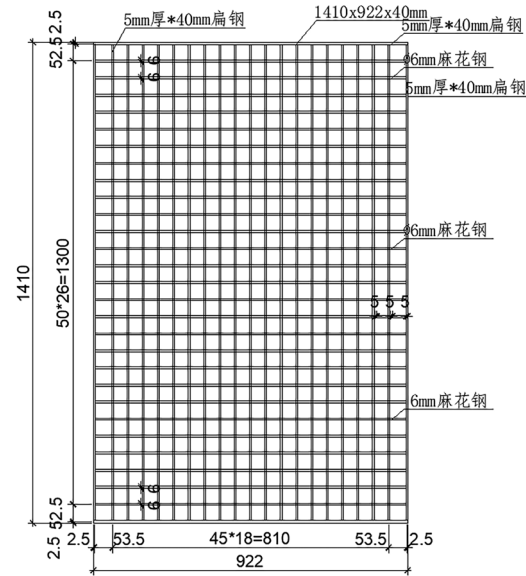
No. 2 grille steel plate (unit: mm)
